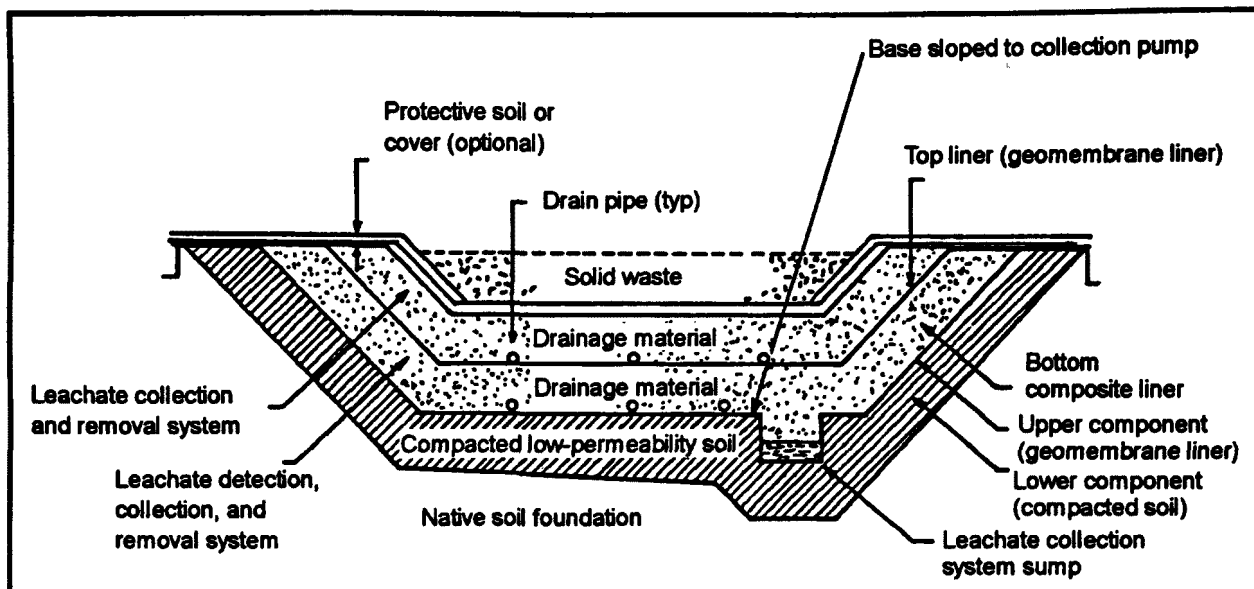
Cross-Section of a Hazardous Waste Landfill System
